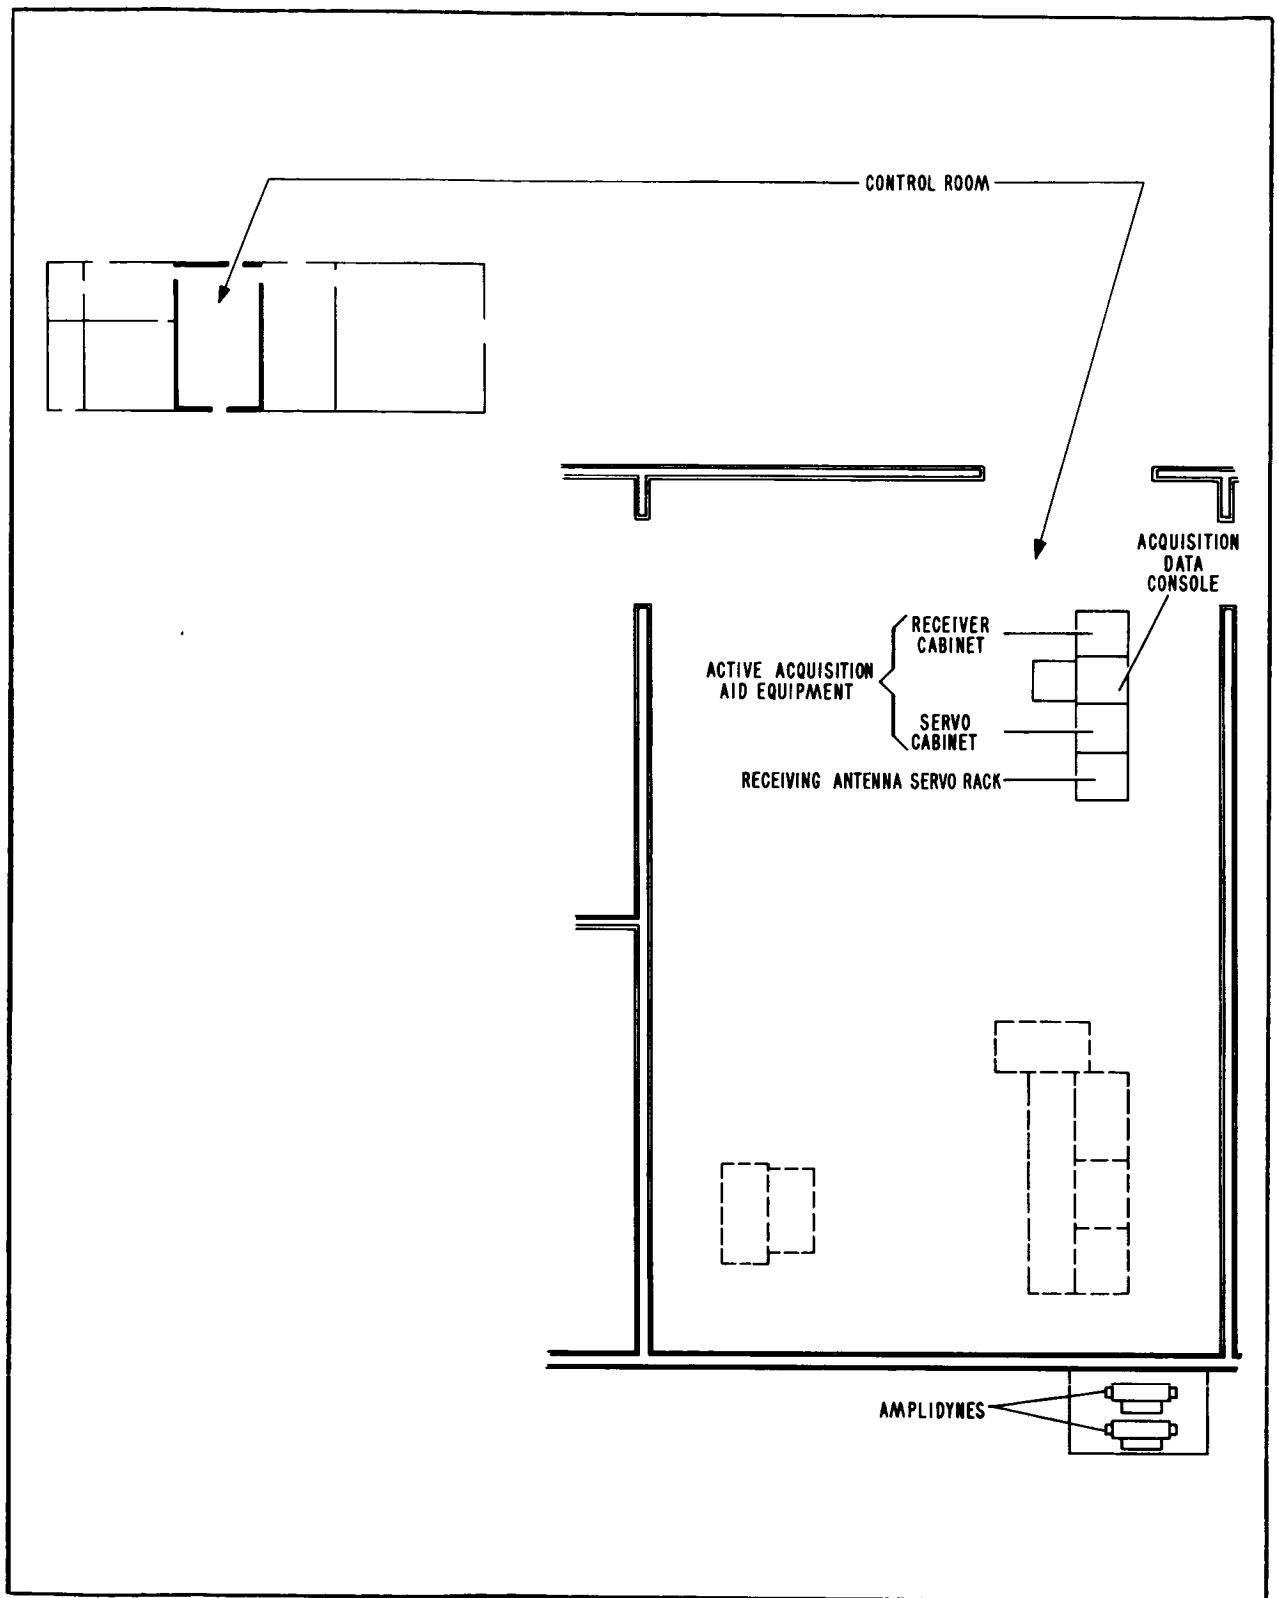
Acquisition System Equipment Layout, Telemetry and Control Building, Zanzibar
